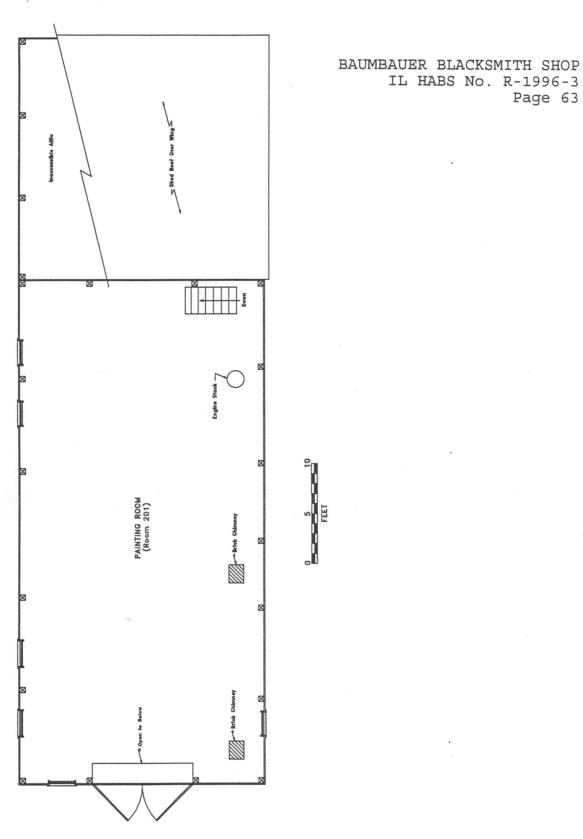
Second floor plan of the Baumbauer Blacksmith Shop, showing construction of rear addition, ca. 1885.
